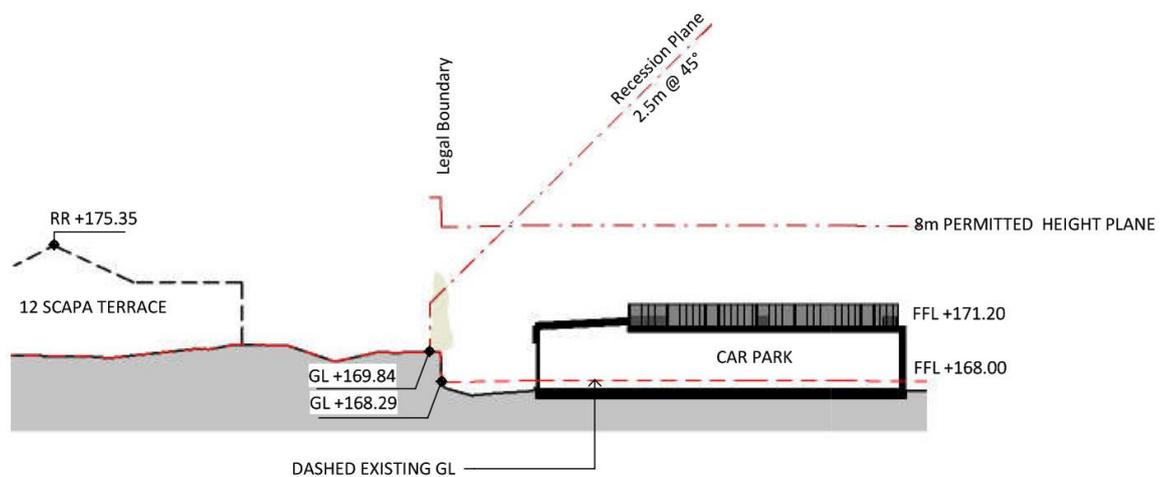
Cross Section depicting relationship between Proposed Village building and property at 12 Scapa Terrace
